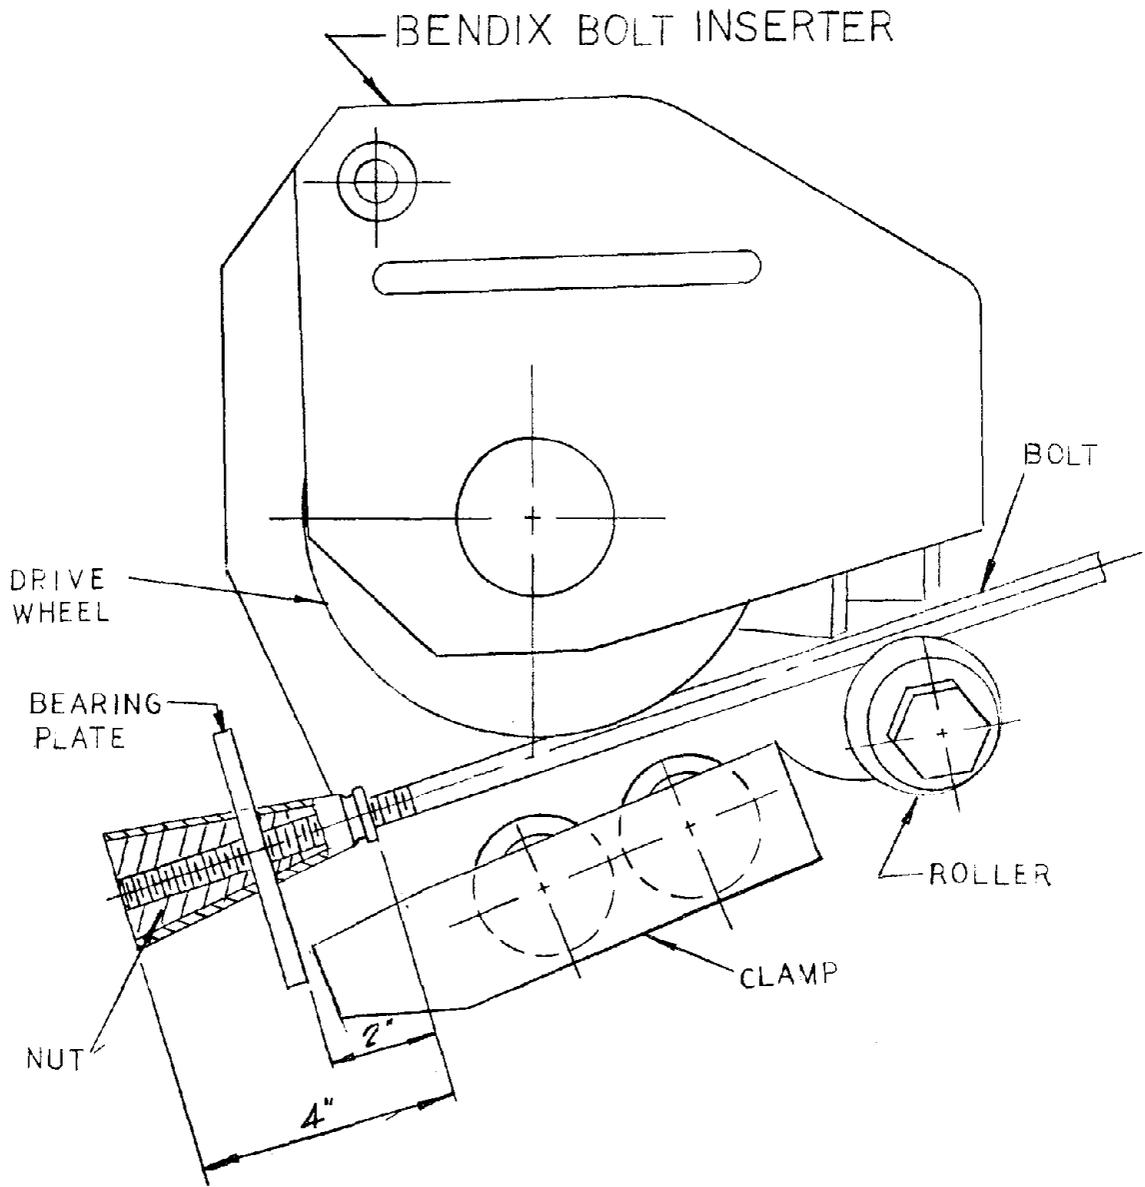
Bendix Bolt Inserter Loading Method No. 3
